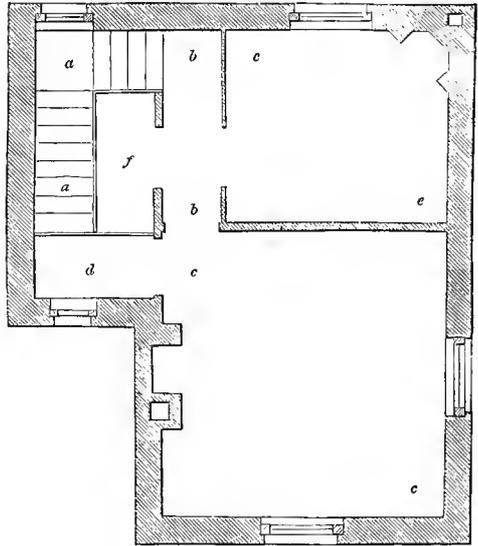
Chamber-floor plan of a two-storey detached cottage—scale in fig. 734.
